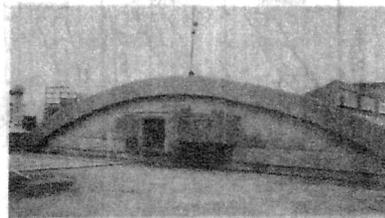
Roof wall damaged by the Atomic bomb (Municipal office)
